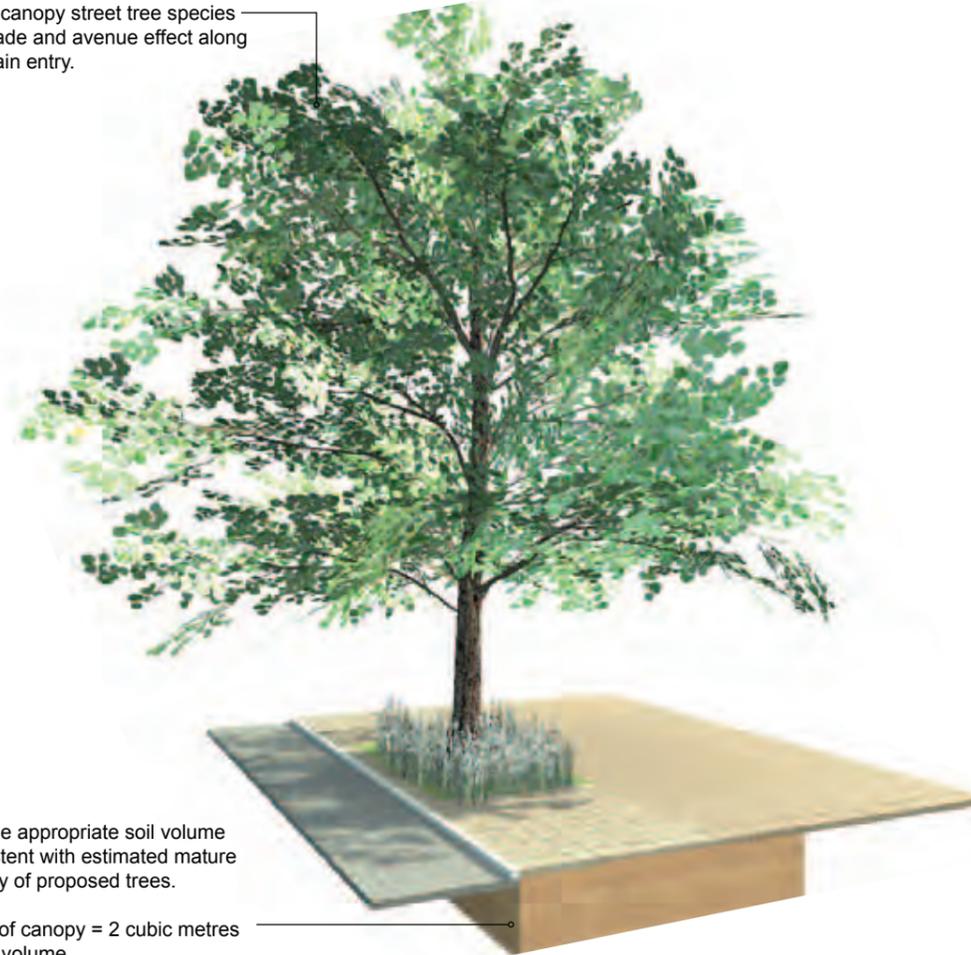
TYPICAL STREET TREE PLANTING - MAIN STREET
